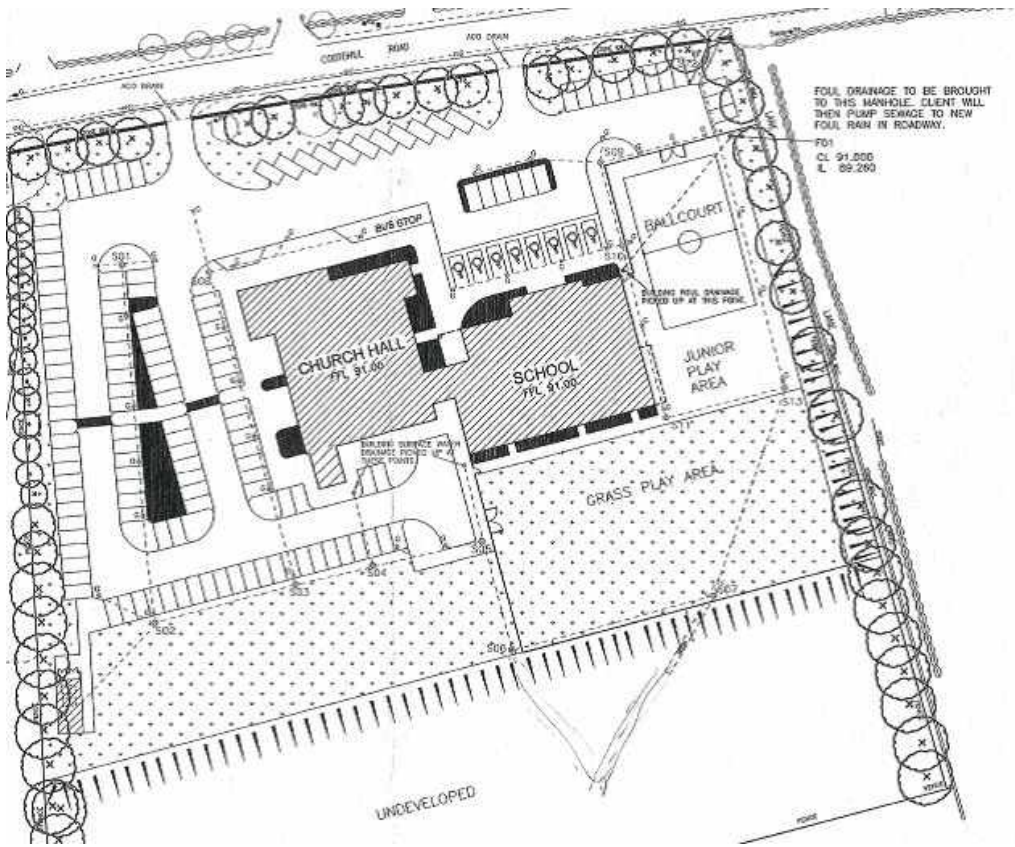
A plan of the proposed church, school, and ancillary works including parking, a ball court, and play areas, which the management committee planned to build on an alternative site three years ago.
